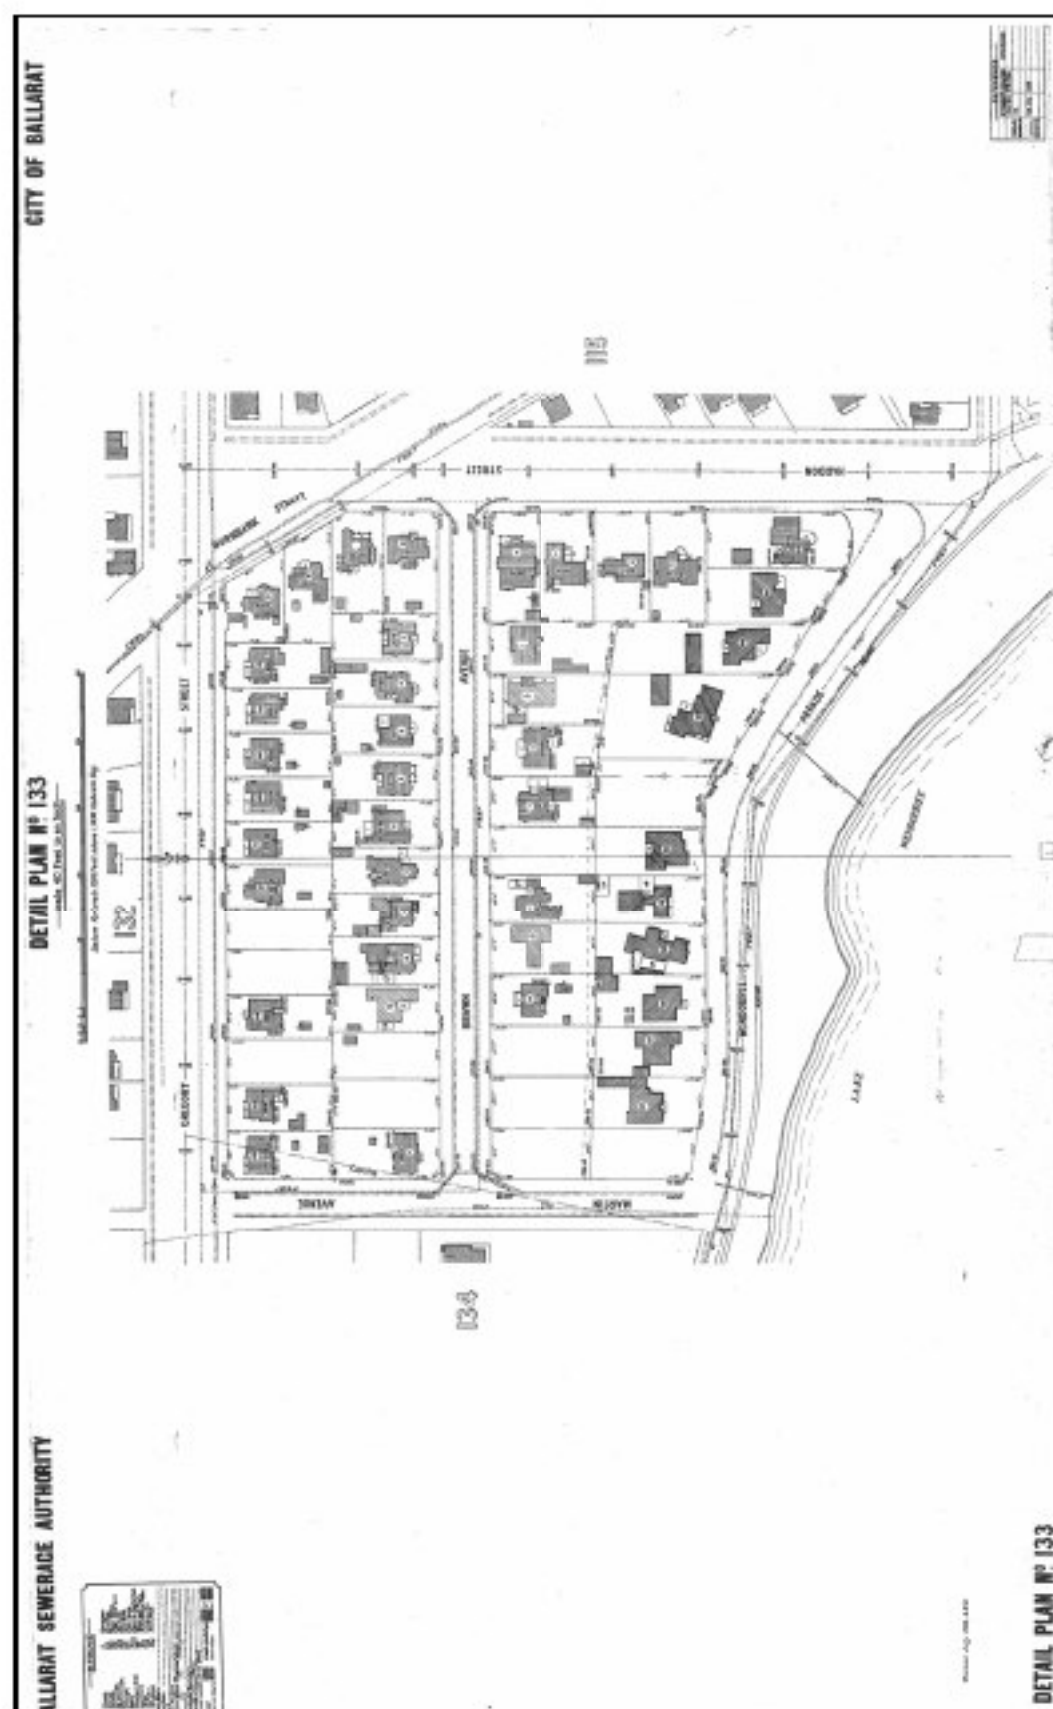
Ballarat Sewerage Authority Plan, 1939. Source: Planning Department, City of Ballarat.
